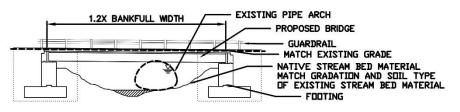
Typical detail of an open arch culvert designed to meet the MA River and Stream Crossing Standards
